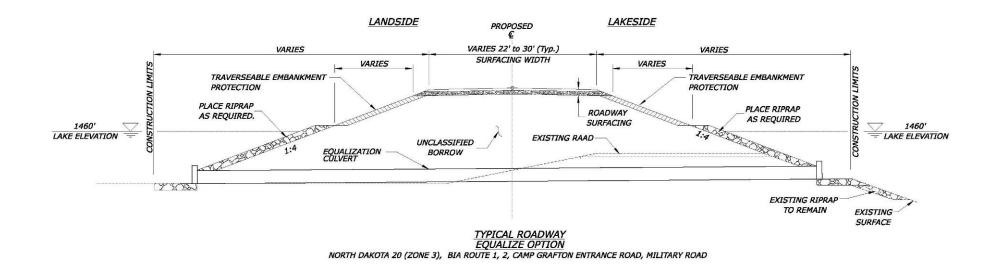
Typical Section for Equalizing ND 20 in Zone 3 and BIA Roads 1 and 2
